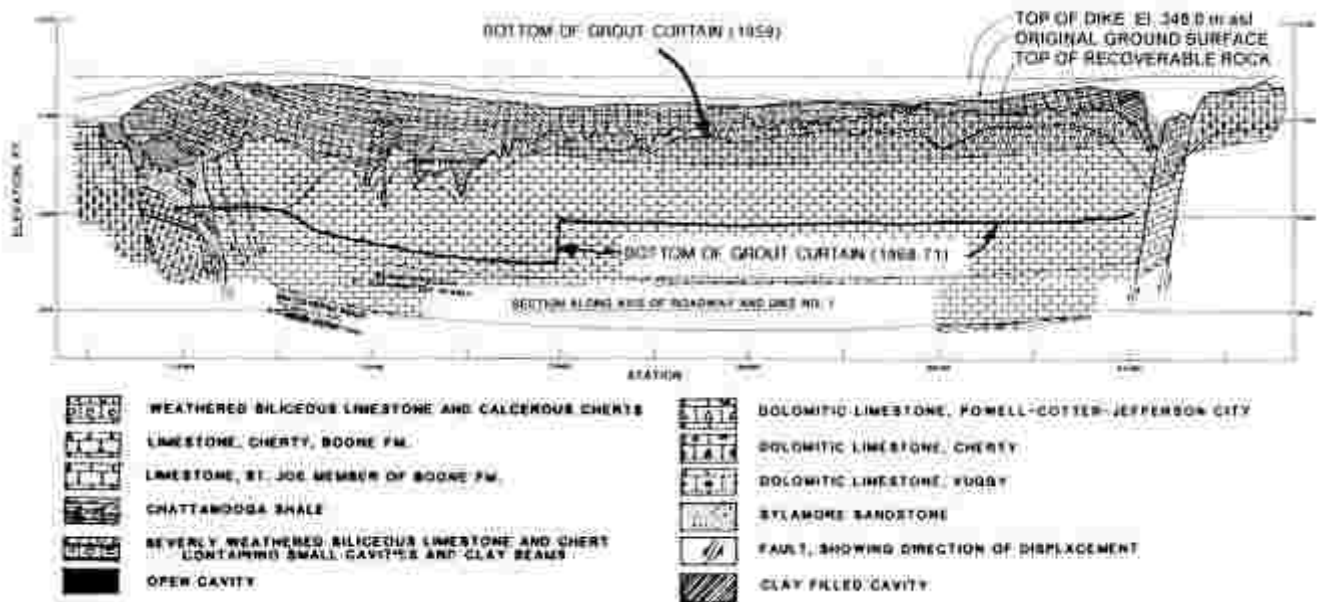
Beaver dam: Foundation conditions at the site of Dike 1 (Llopis et al., 1988)
